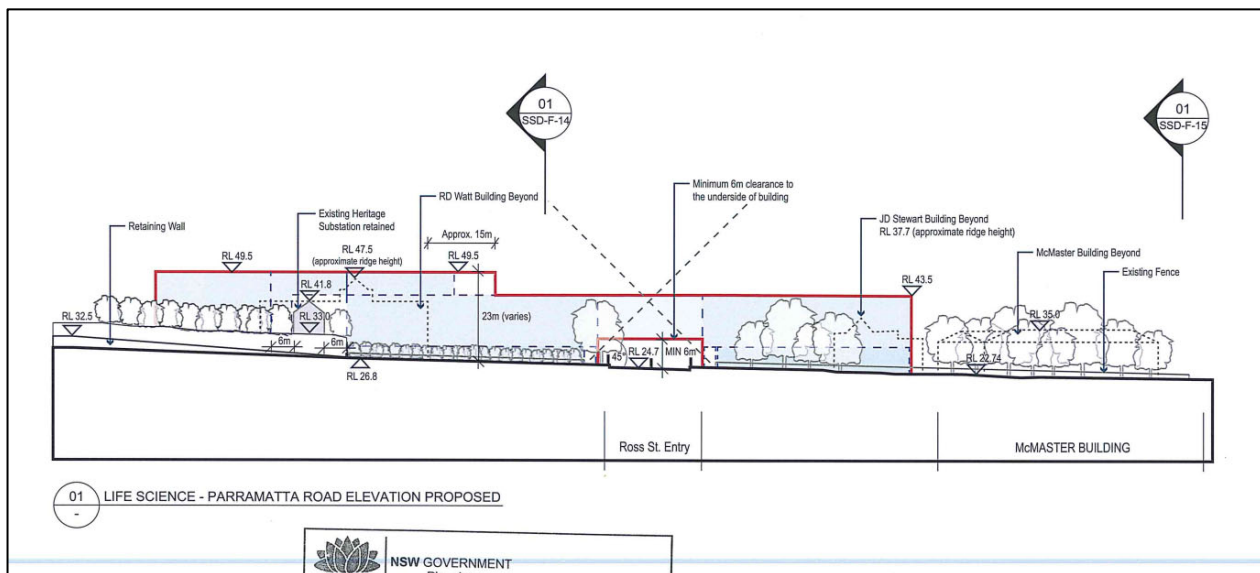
| CIP – Approved Life Science building envelope – Parramatta Road elevation (Source: SSD-6123)
